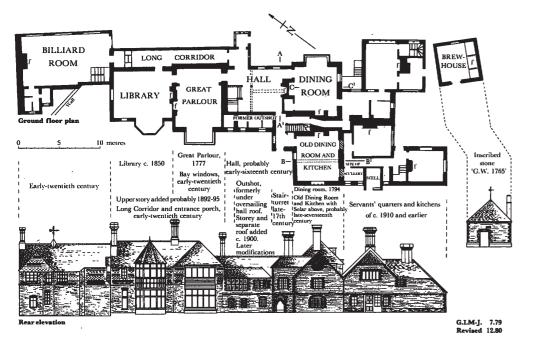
The Wakes: ground-floor plan and rear, or garden, elevation.
